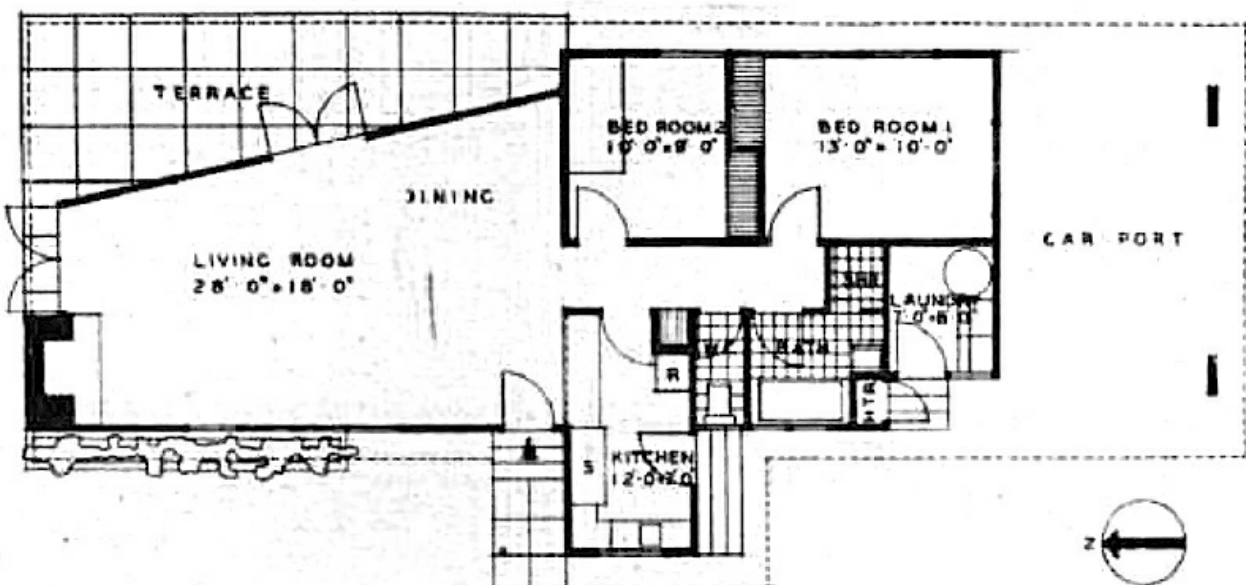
Plan of *Lilly Pilly*, Blackheath, as built (Anonymous n.d.).
